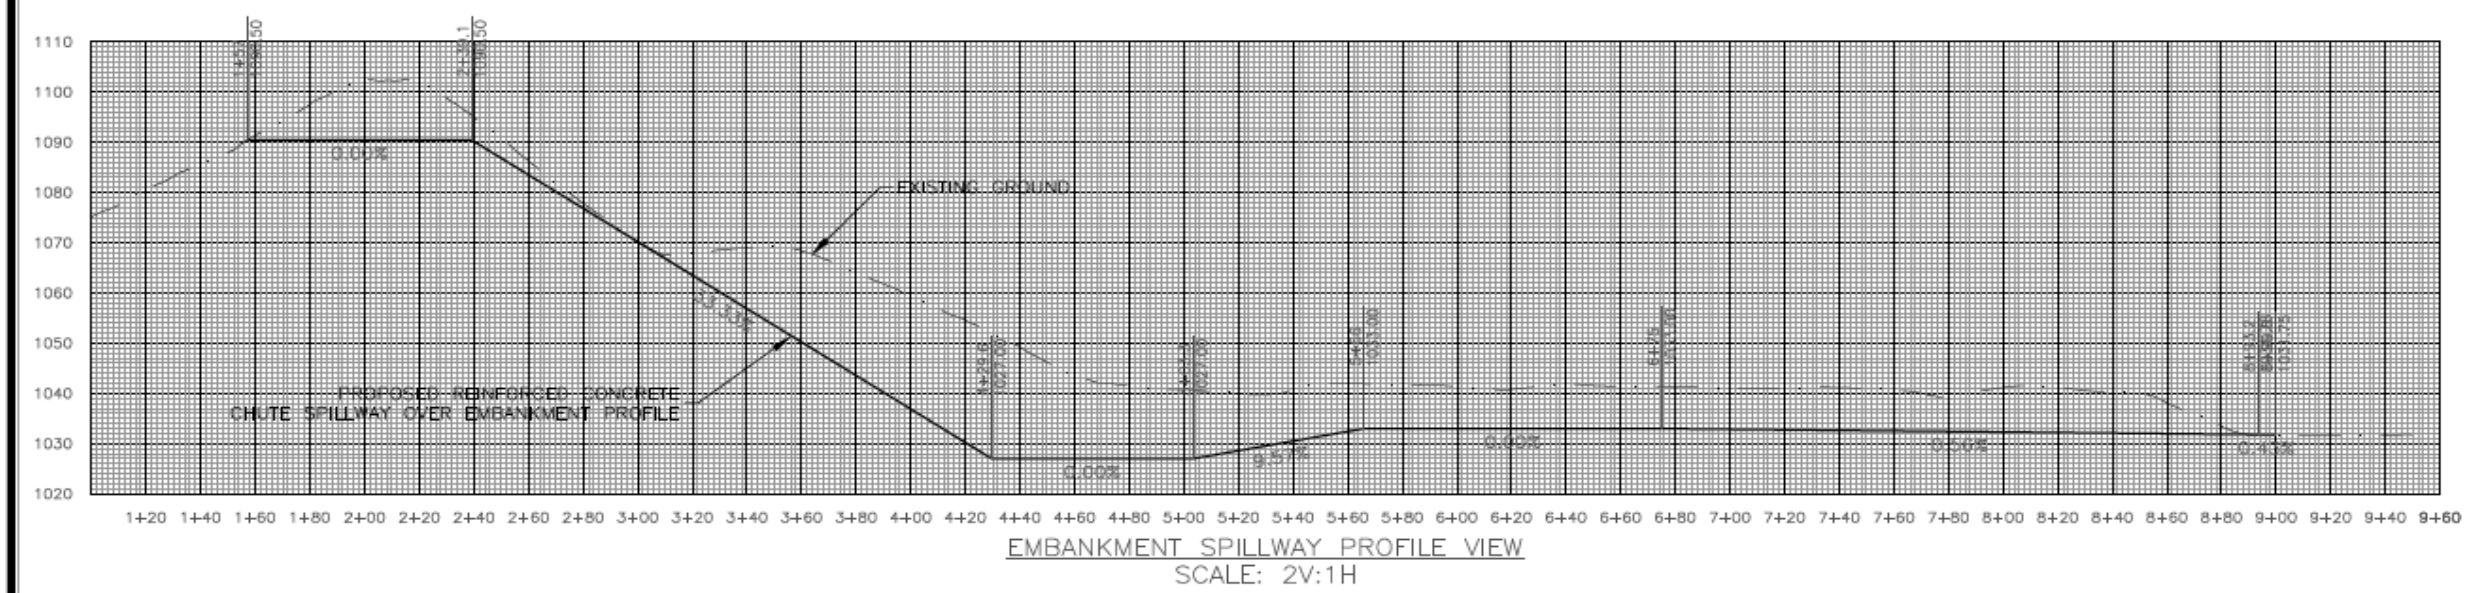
Alternative 8: Structural Chute Plan and Profile - Over Top Dam with Type II Stilling Basin
